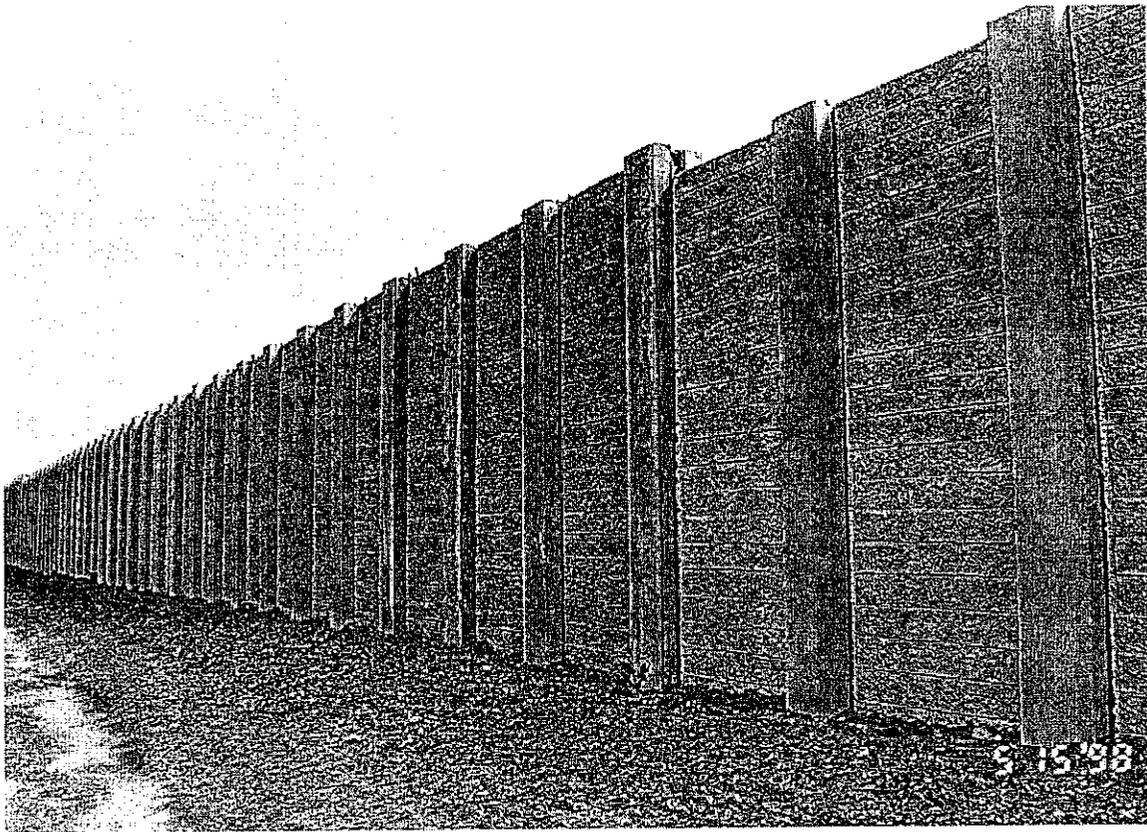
Precast concrete barrier, I-355 at Boughton Road.
